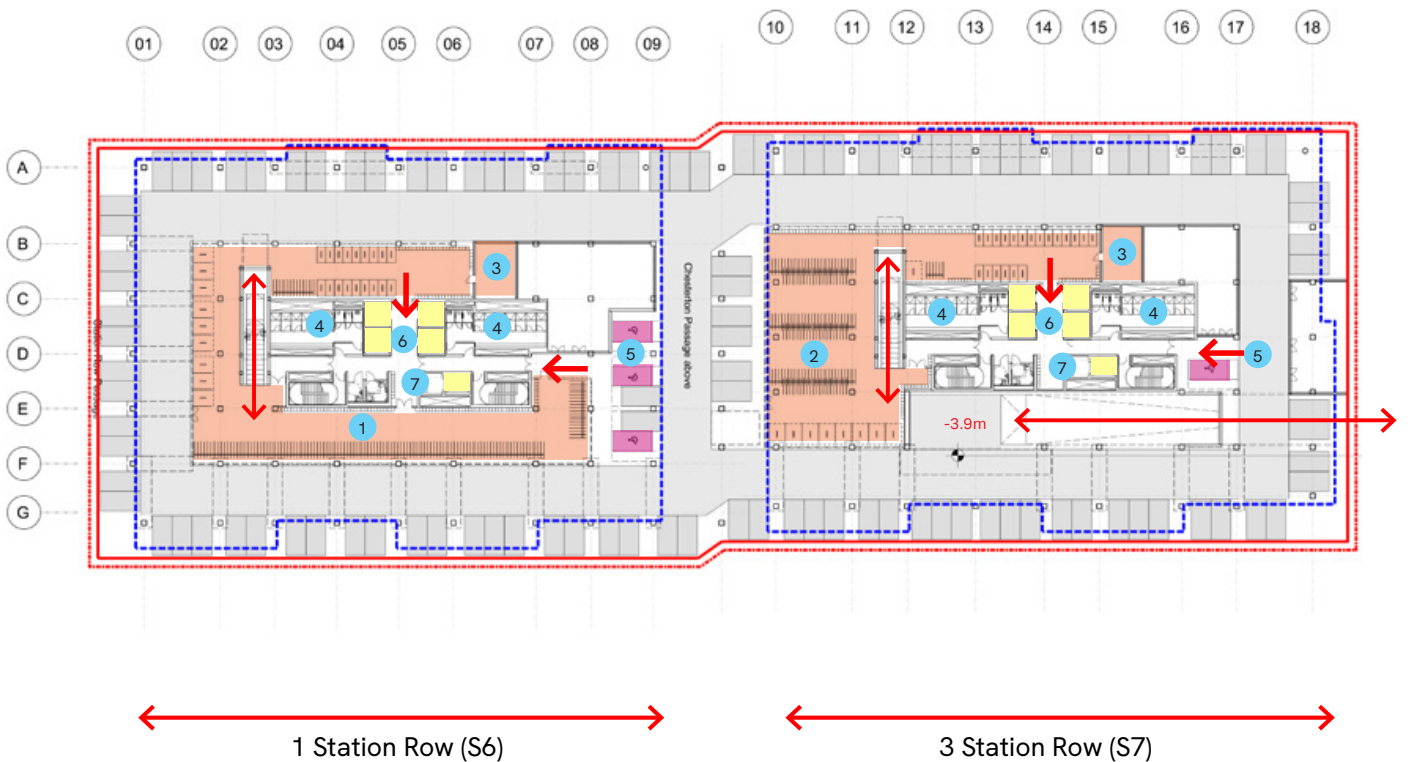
Basement plan showing access and movement strategy. (CD2.74).
